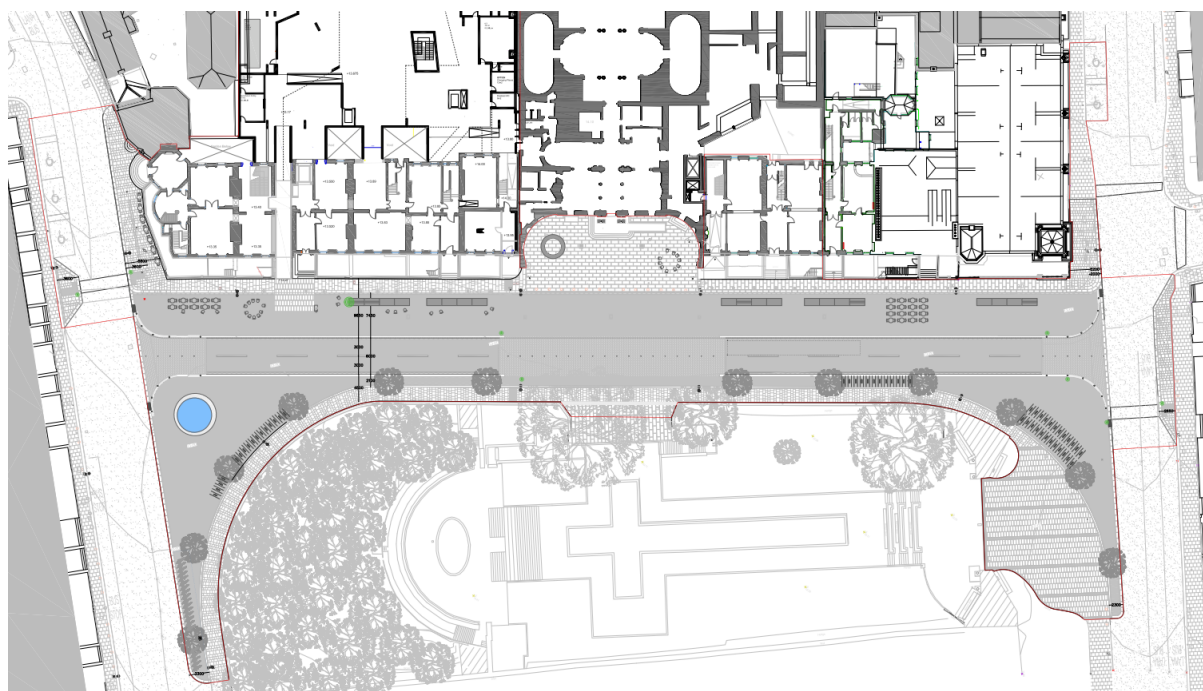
Proposed New Public Realm Parnell Square North (Source: Bernard Seymour Landscape Architects)
